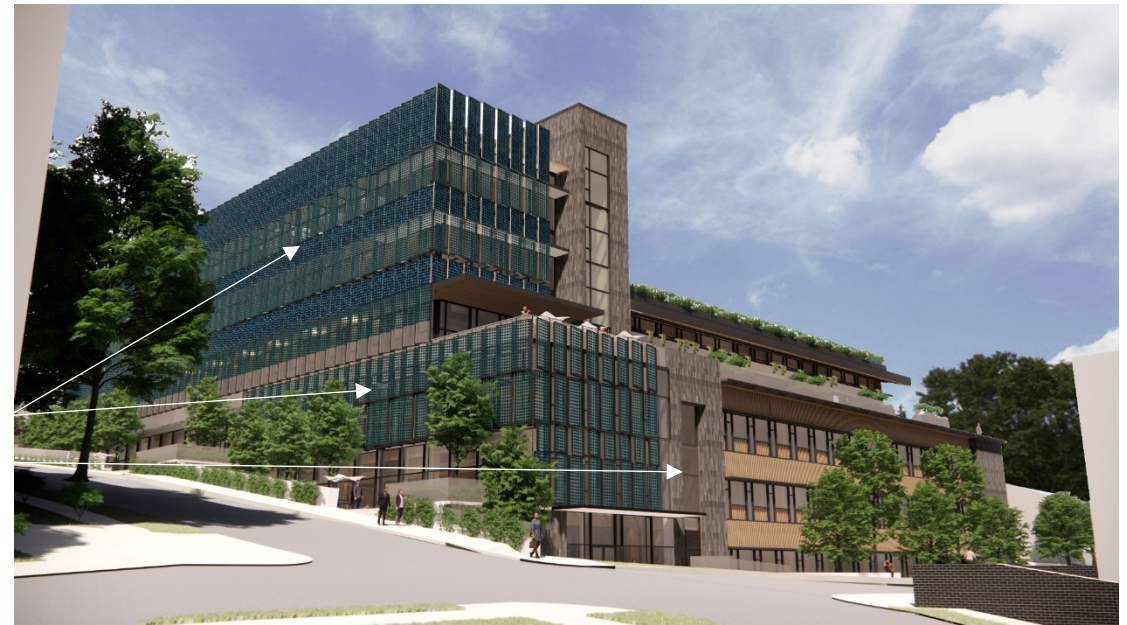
South and West Facades (View from 19<sup>th</sup> Street and White Avenue)
